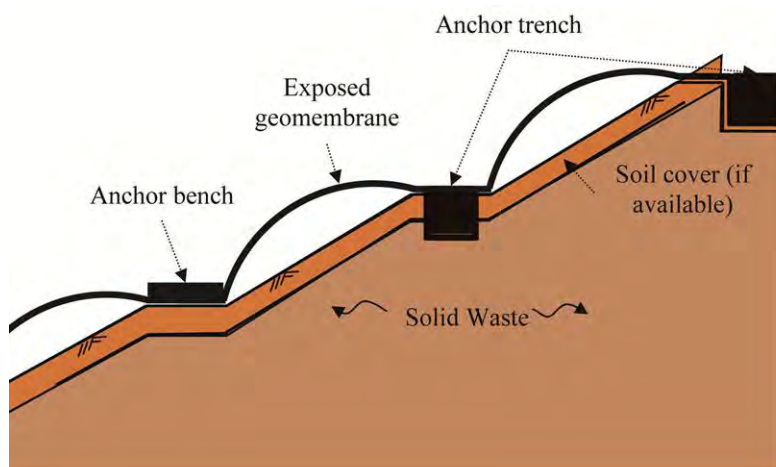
Example of Horizontal Anchorage (Yeo et al. 2011)
